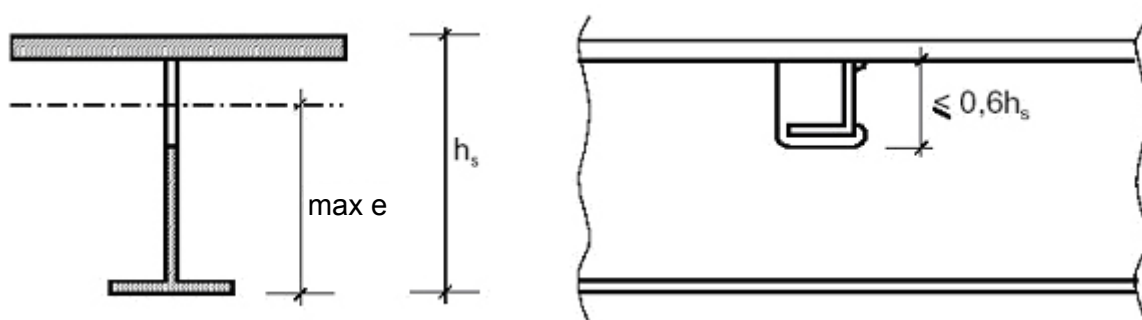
b. Cut-outs in transverse stiffeners
